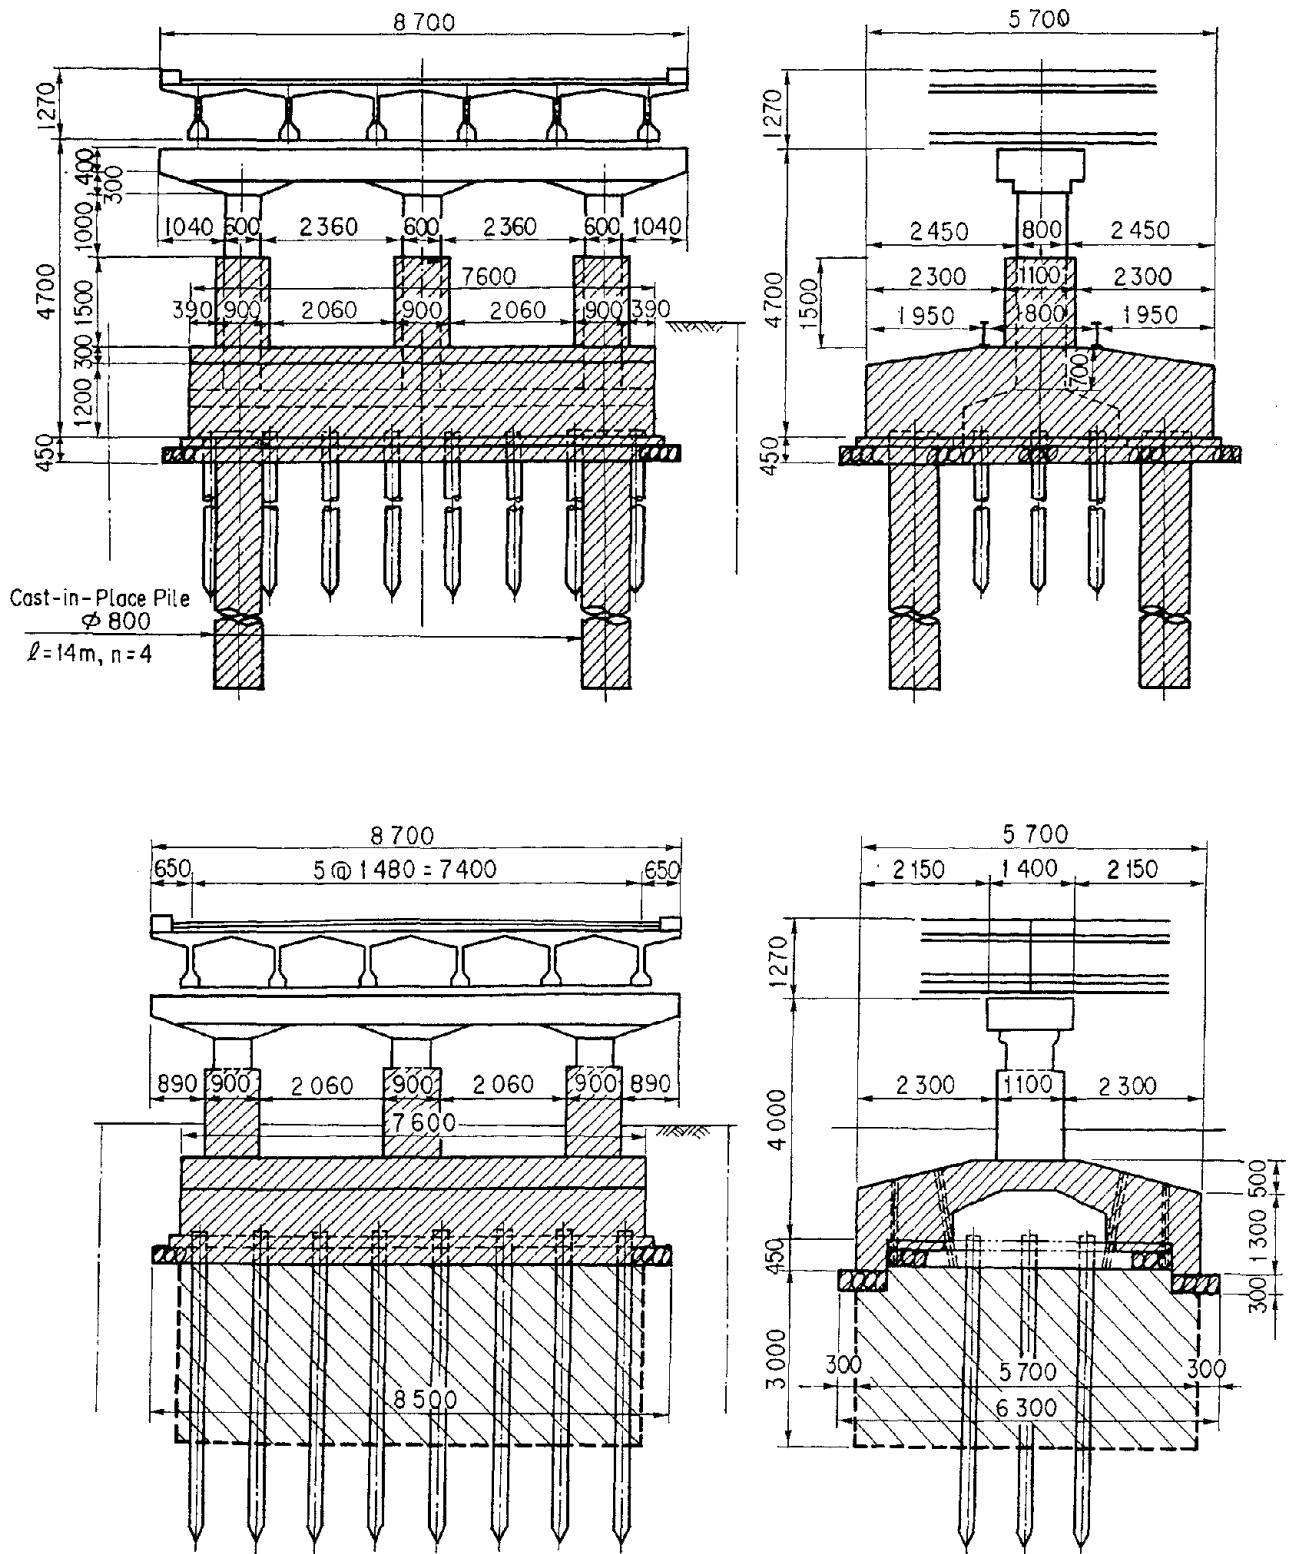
Seismic Strengthening of Foundations by Increasing Number of Piles and by Enlarging Footing
